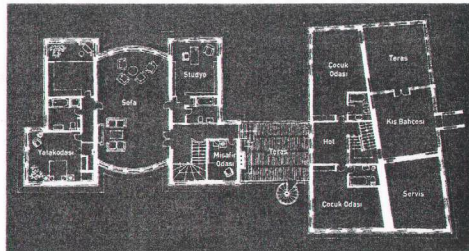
Ilıcak *Yalı* –first floor plan.
